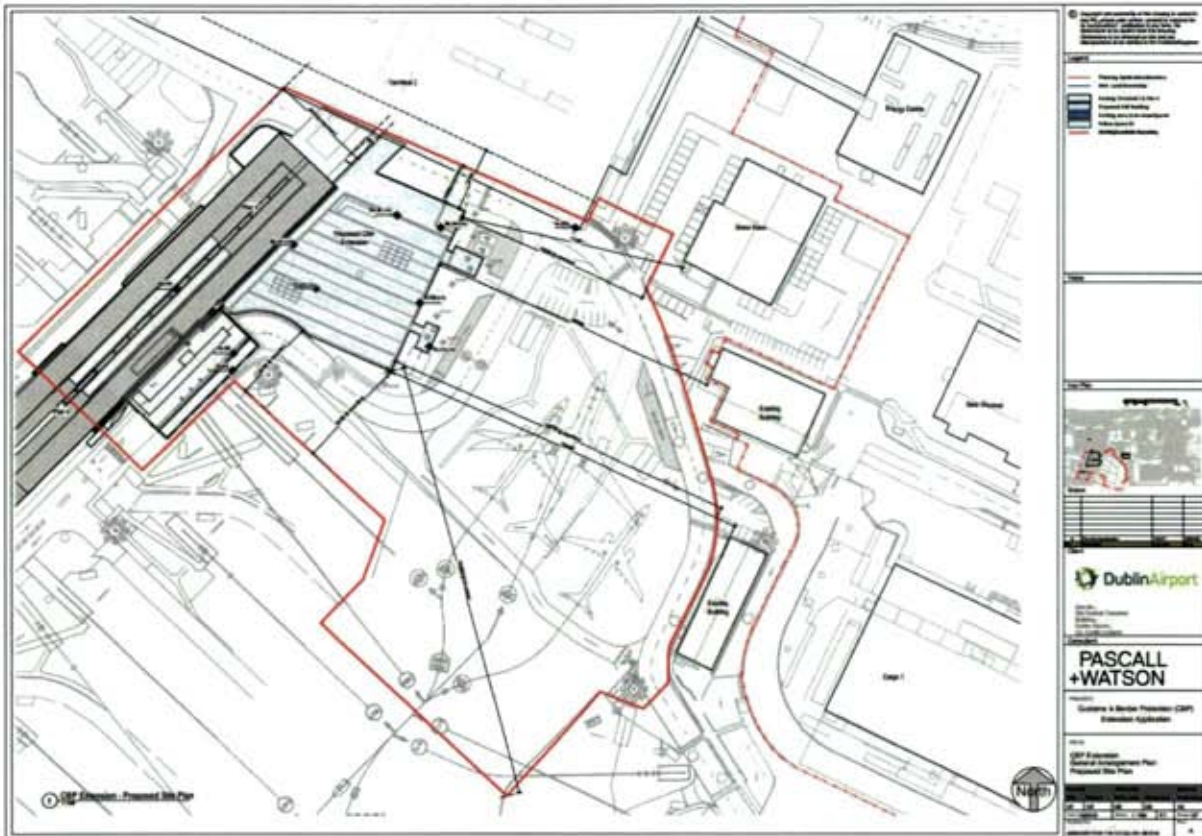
Proposed Site Layout Plan for the US Customs and Border Protection
